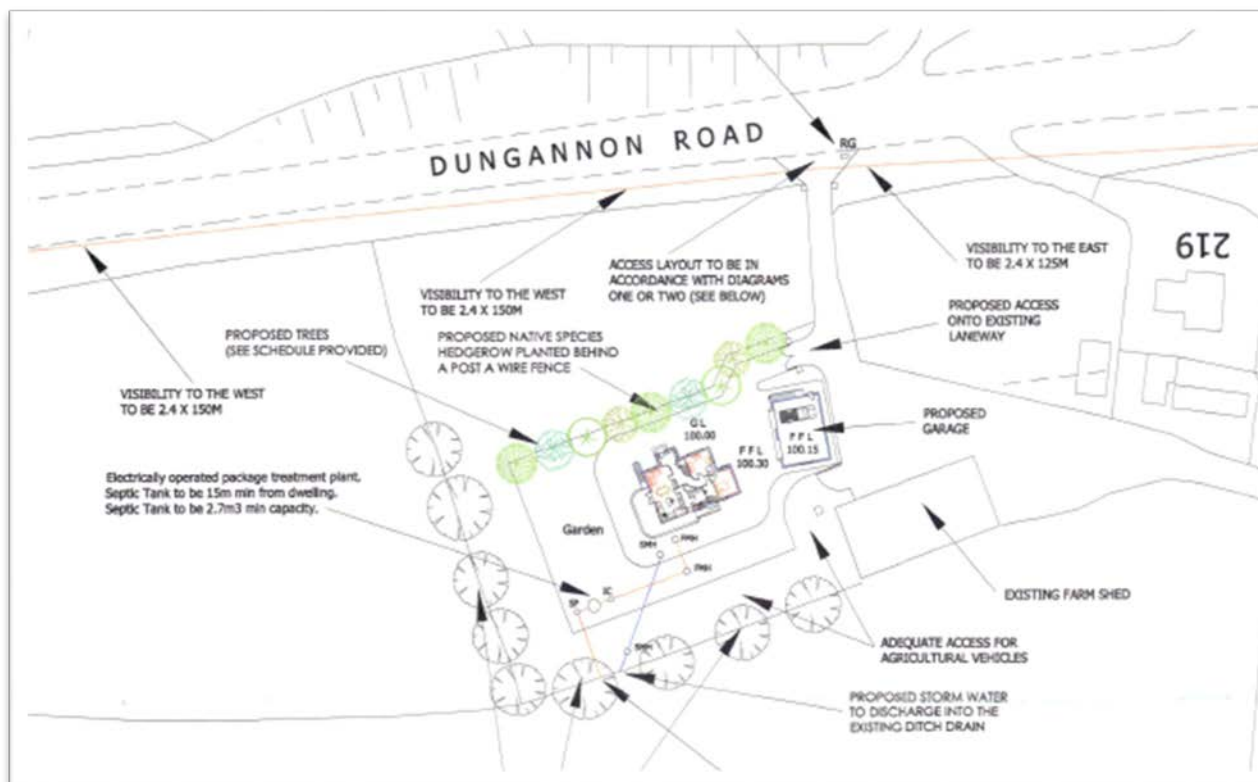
Approval for dwelling east of site under LA09/2021/0301/RM (it is considered this dwelling will not have frontage to road when works are completed).
